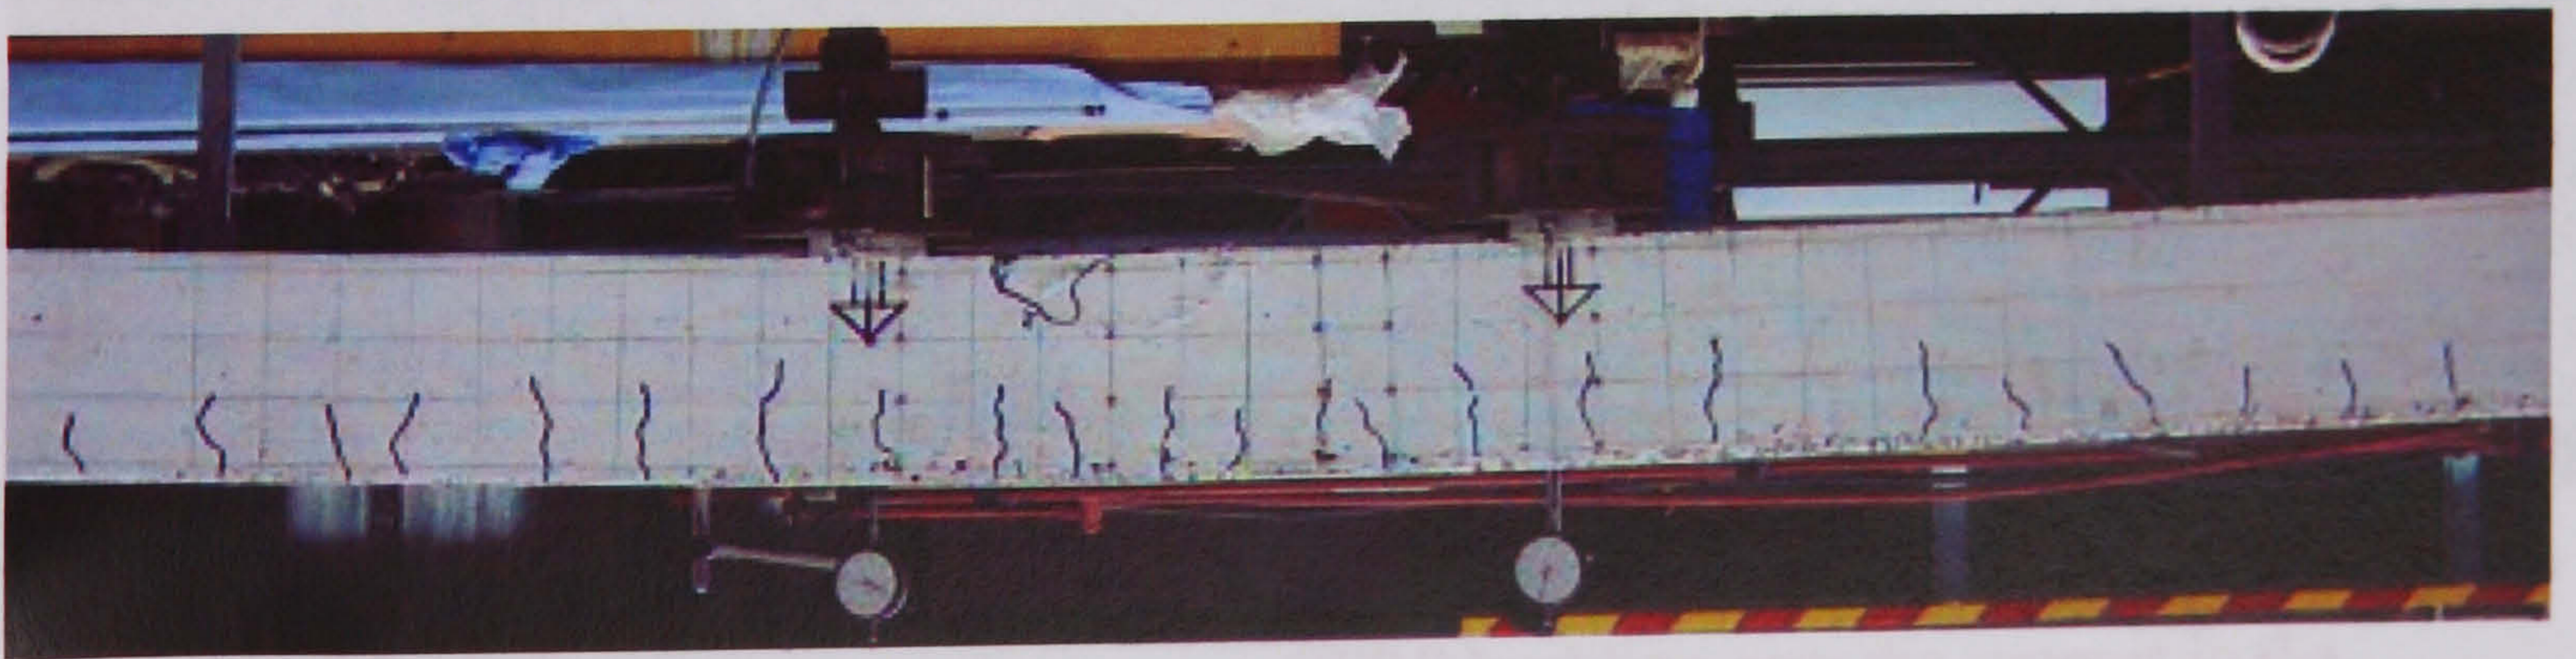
Typical cracks at failure for strengthened beams III1-OL-UN
